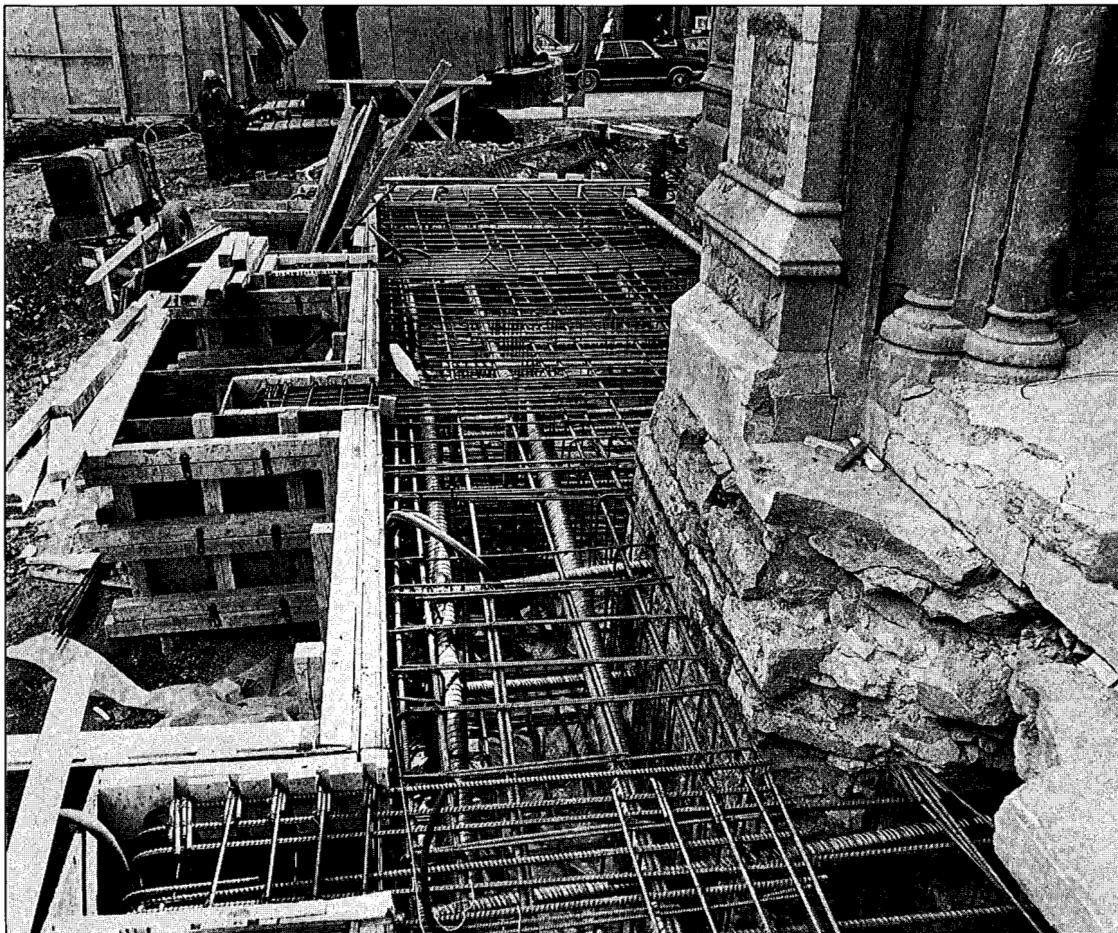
Beam surrounding the existing cathedral foundation prior to pouring concrete.
